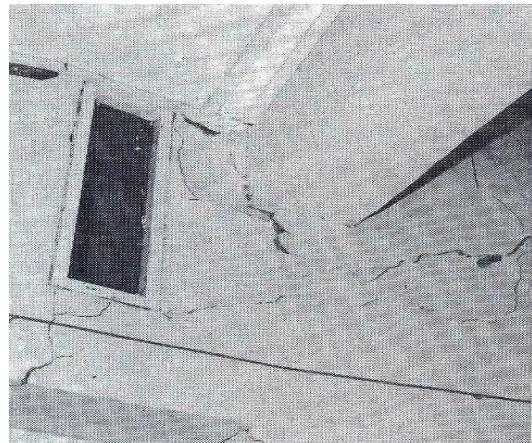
A fragment of a brick wall's destruction ("Druzhba" cotton spinning factory, №8)
